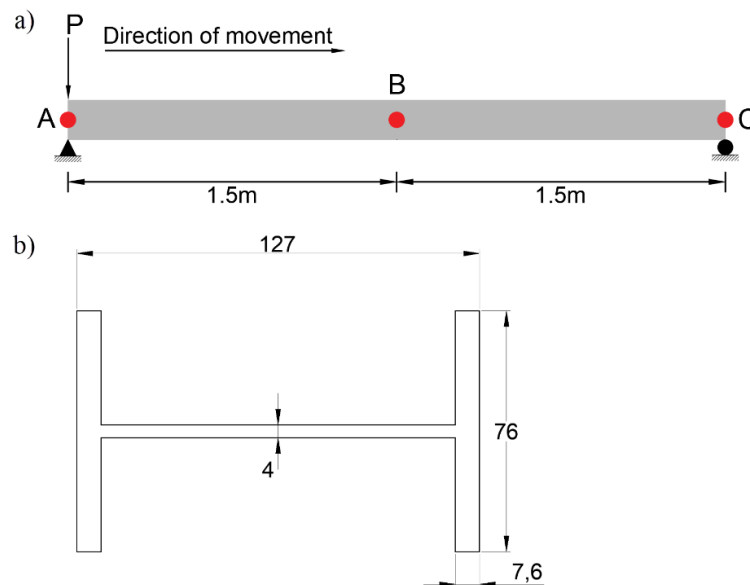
Numerical beam model a) Elevational view showing sensor locations b) Cross-sectional view.
